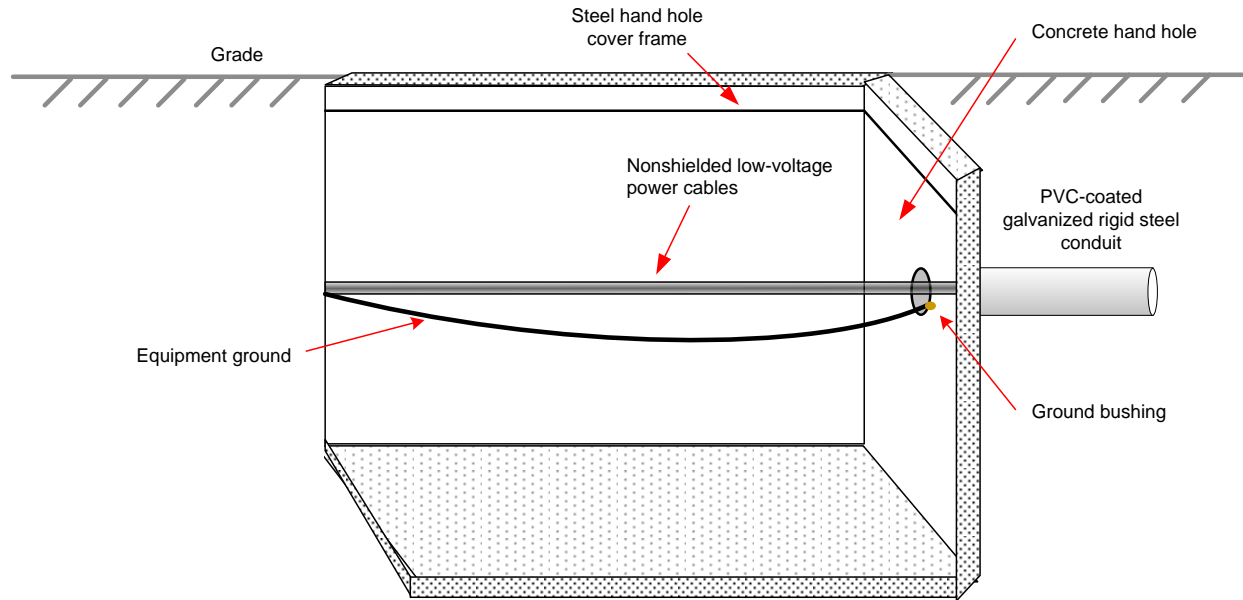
Hand hole grounding installation detail.
